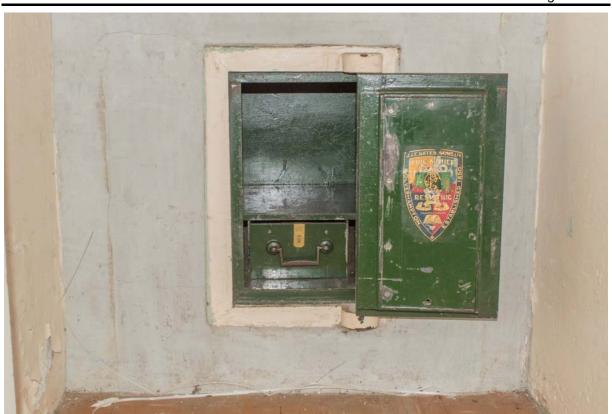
Building 19: western house, ground floor, safe within former pantry (SGA15-554)
